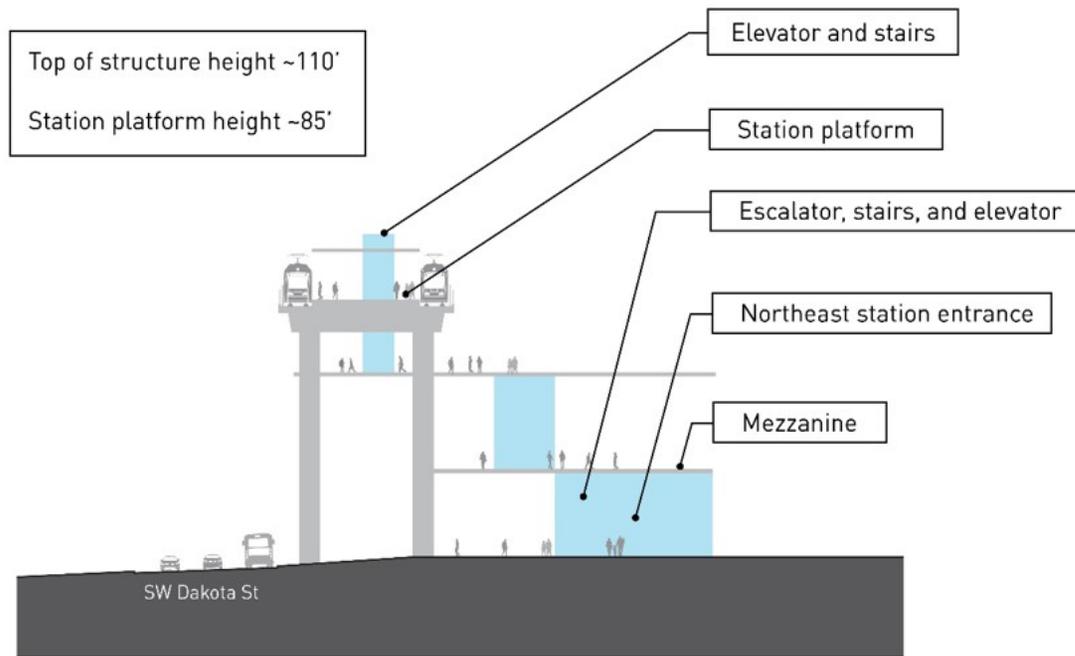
Cross section for Dakota Street Station Alternative (DEL-1a)
